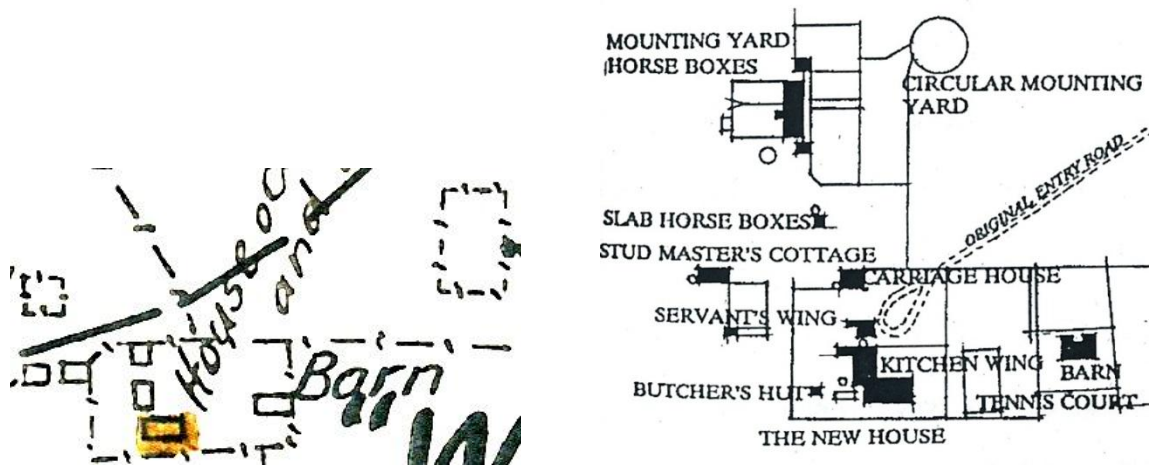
Footprint plan of the homestead buildings in 1892 (Source: LPMA, Primary Application packet 8868, plan, detail), on left. On right, Bernard Collins' suggested plan of the same area under Allen and McDonald between 1900 and 1908 (Source: Collins, 'Wambo Homestead', p.38 plan 5). In the 1892 plan the yard on the left was for milking cows, while the stockyard on the upper right lies well to the east of the mounting-yards and horse-boxes of 1905-1907.
